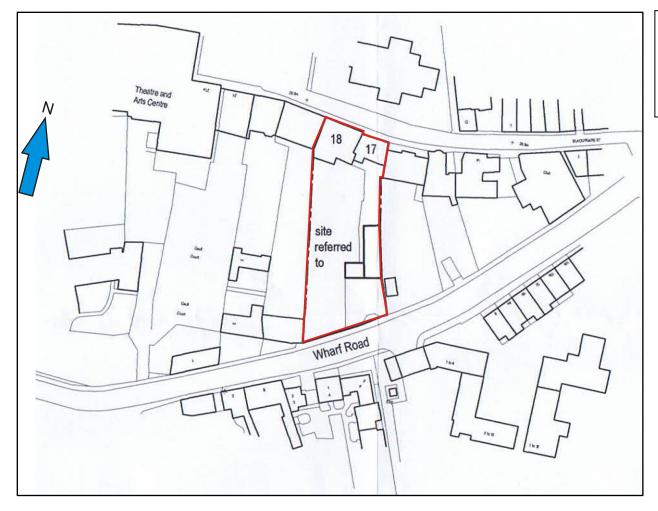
Site location at an original scale of 1:1,250 showing the existing buildings on the site (extract from Architects plan) The objectives of the project were:
